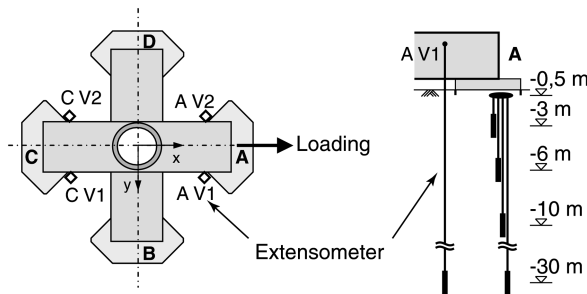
Top view on the plates of the test foundation and the installed extensometers below and aside the plates, after [19].
